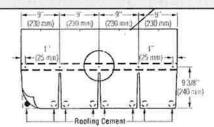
Eastening Halteras Shingles on Steep Slopes
